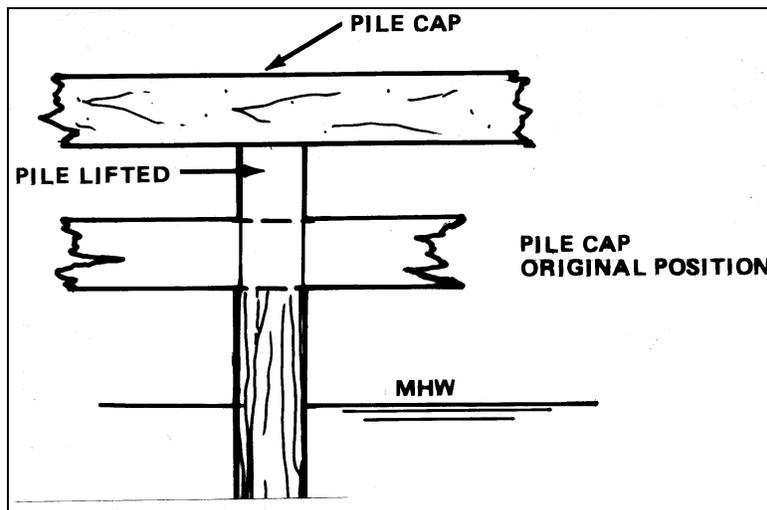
One Potential Consequence of Steel Connecting hardware failure in timber Construction.
